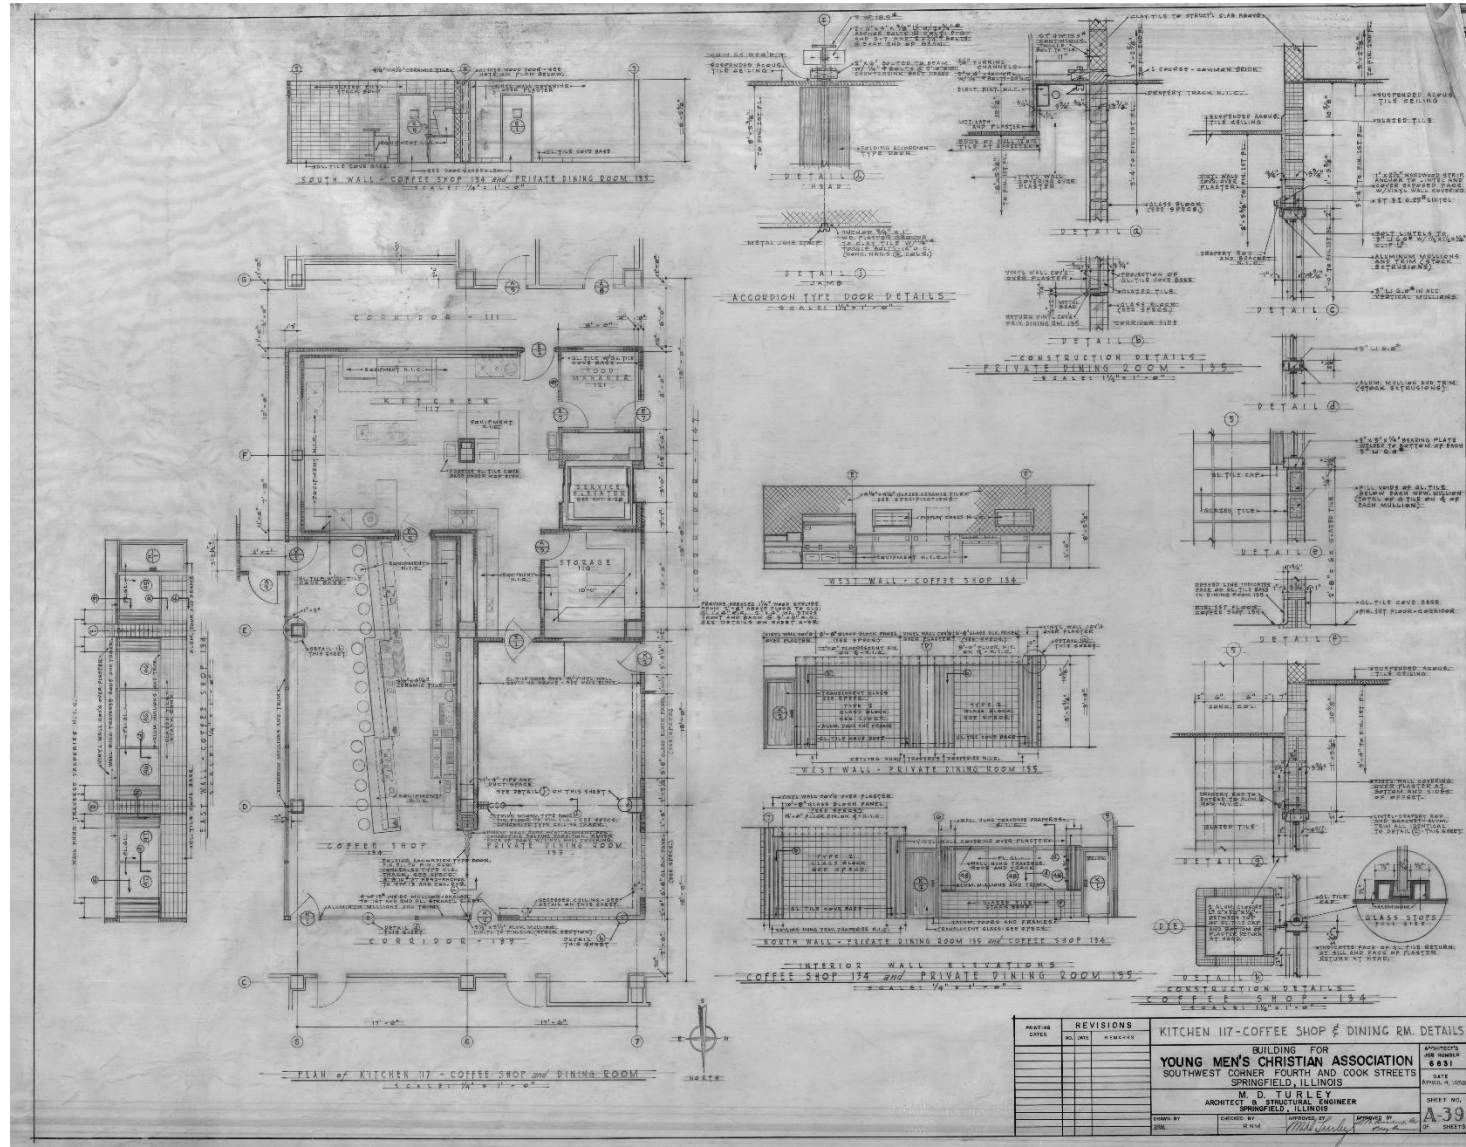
Kitchen 117-Coffee Shop & Dining Rm. Details (Sheet No. A-39).
